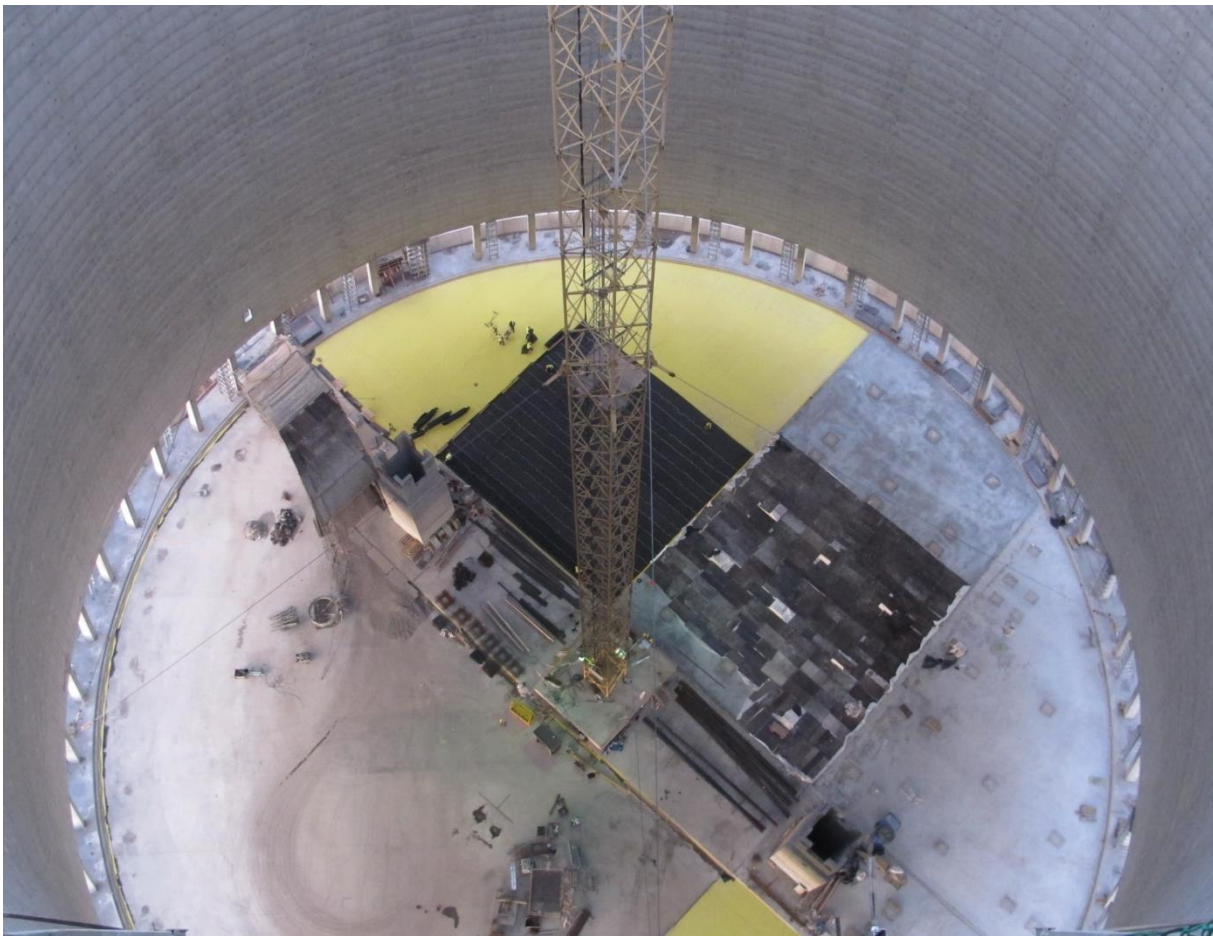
Building the foundation plate and prefabricated building-in while the tower shell is being build-up. First, insulation is being laid, then reinforcement is put in place and finally the plate is filled with concrete
